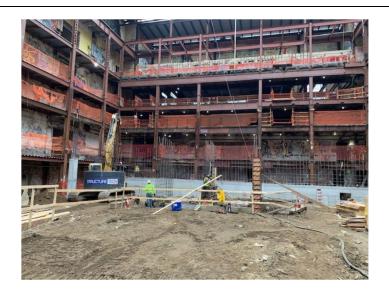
Facing west, Bunlin LLC continues masonry work and wall construction at the boiler house superstructure.
